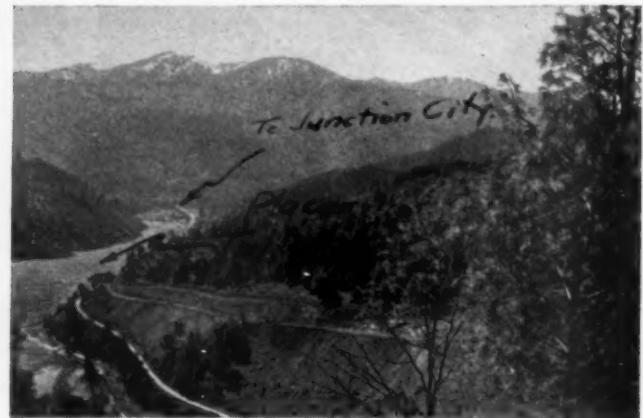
View of New Road on Slope of Poison Gulch West From the Hydraulic Cut
